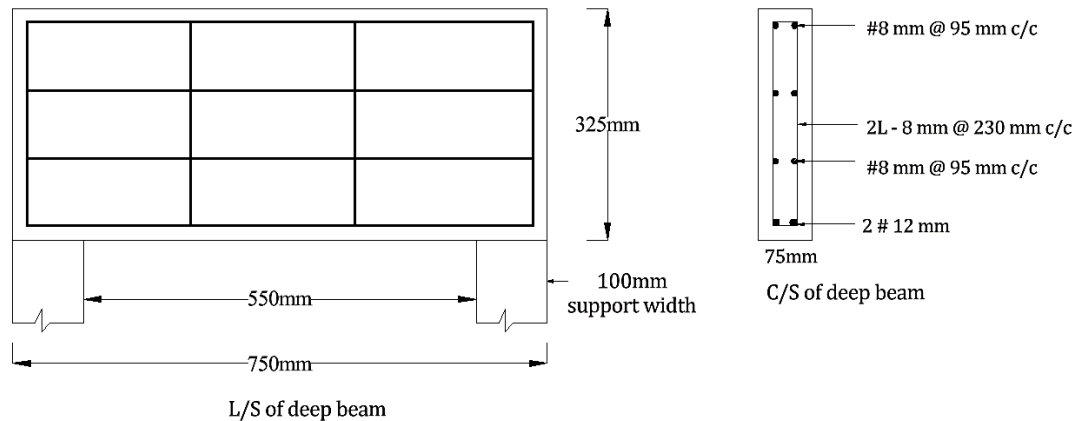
Schematic illustration of longitudinal and cross-sectional reinforcement details of the deep beam (SDB)
